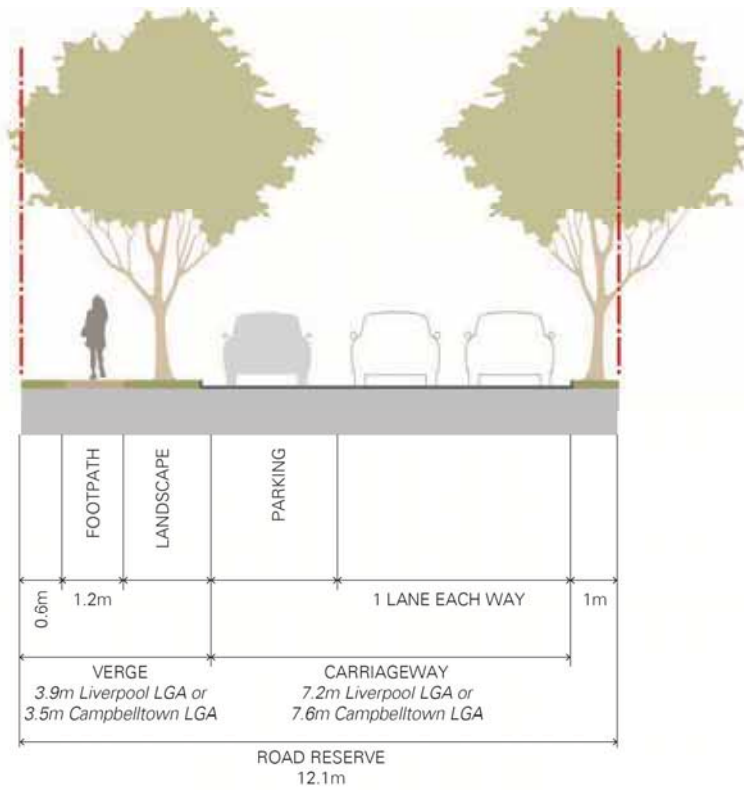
Typical Minor Road Park Edge / Asset Protection Zone section
